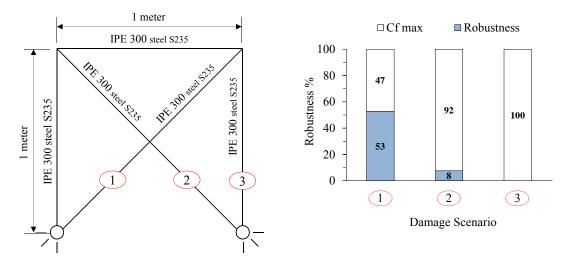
Example truss structure (left) and damage scenario evaluation (right)
